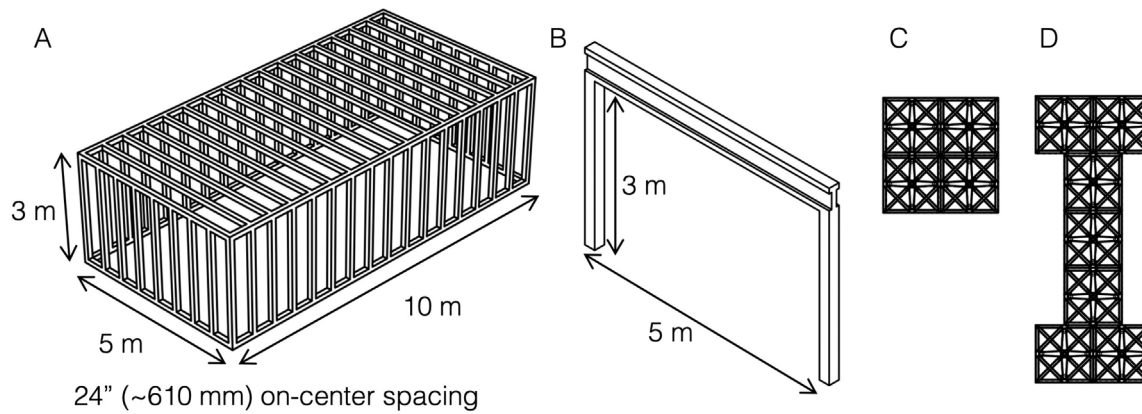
Diagram of the simplified structure used for our estimates, showing the base plan for the 24" (610 mm) on-center spaced stud framed 5 m × 10 m × 3 m building, the single spanning frame element used for evaluating the voxel approaches, and example cross sections of the stud and joist elements.
